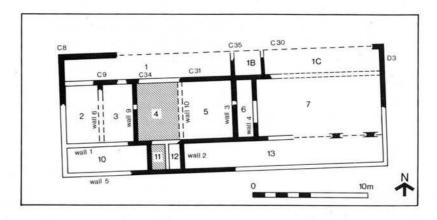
Plan of Building 3 (incorporating details from Site I and Sites C and D)
